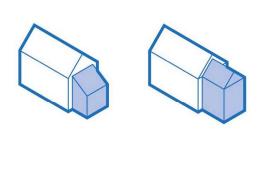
Good example of a side extension which respects the roof pitch, materials and scale of the original building.
